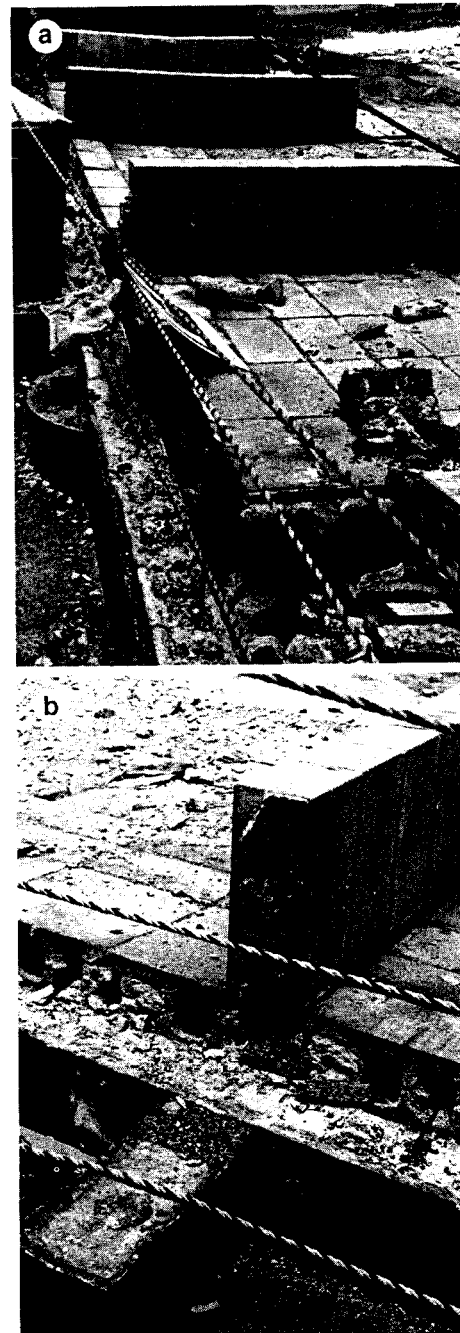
Failed reinforced concrete block masonry garden wall: (a) global view; (b) close-up view.
